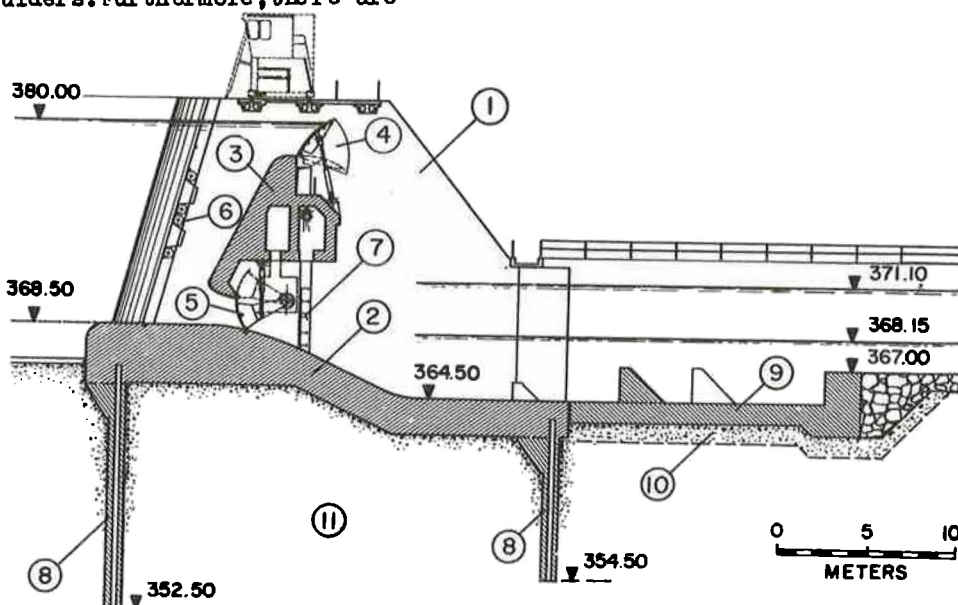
LONGITUDINAL SECTION OF A SPILLWAY BAY
